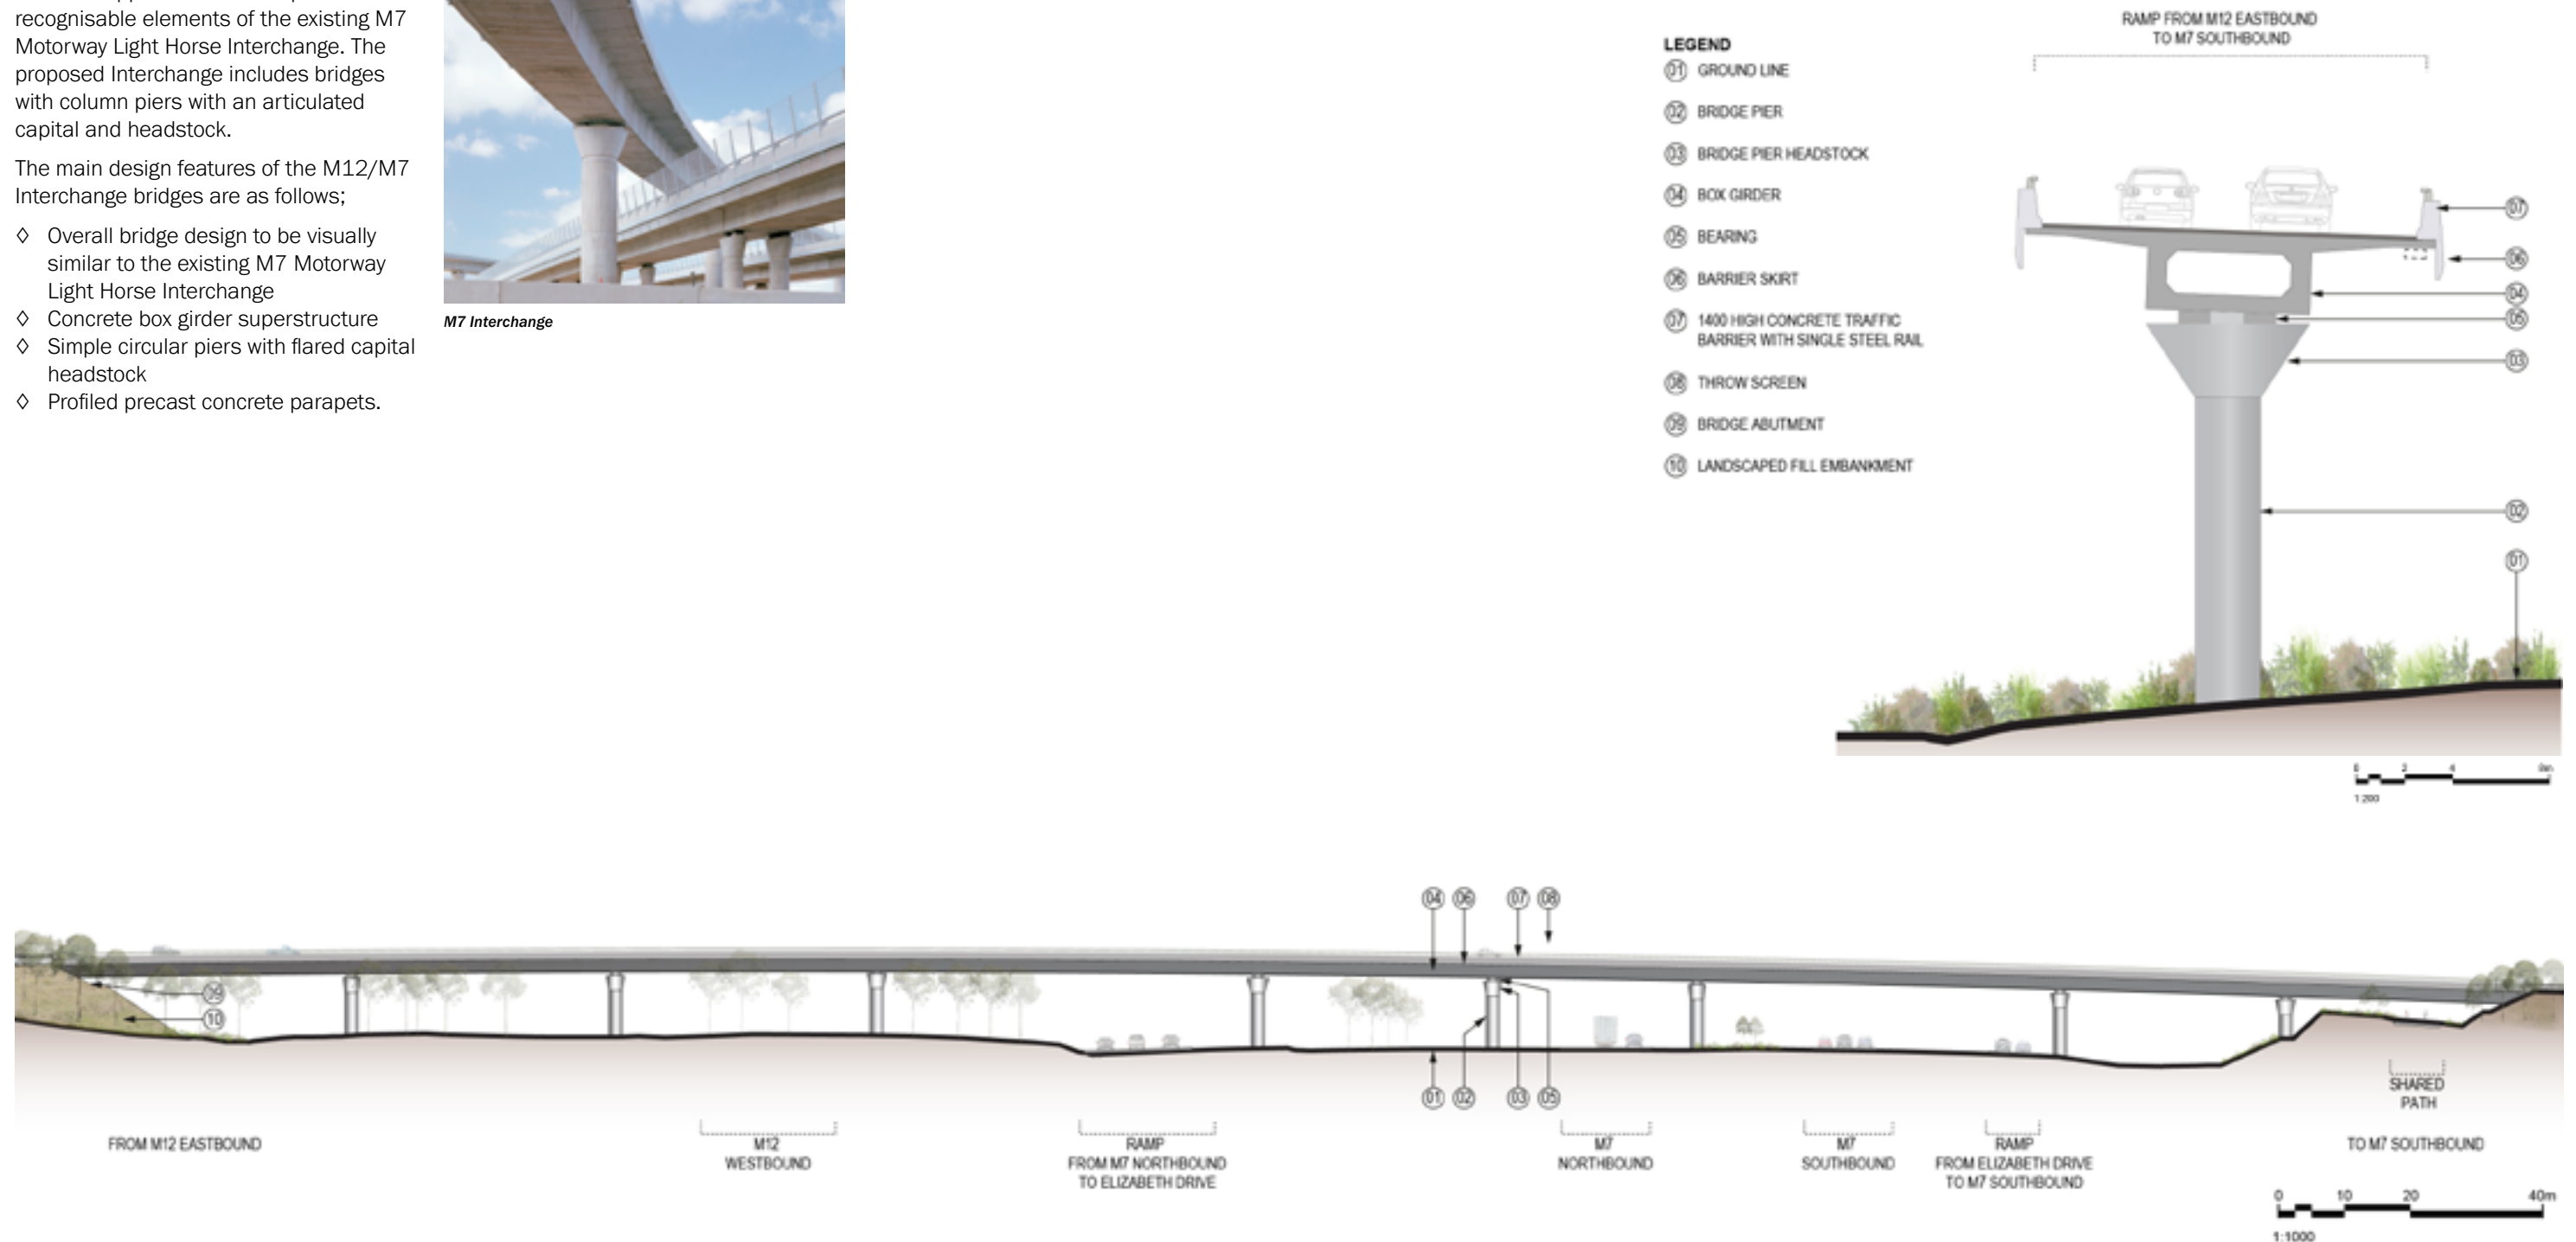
Elevation - BR15 - Bridge over M7 – M12 Eastbound to M7 Southbound
